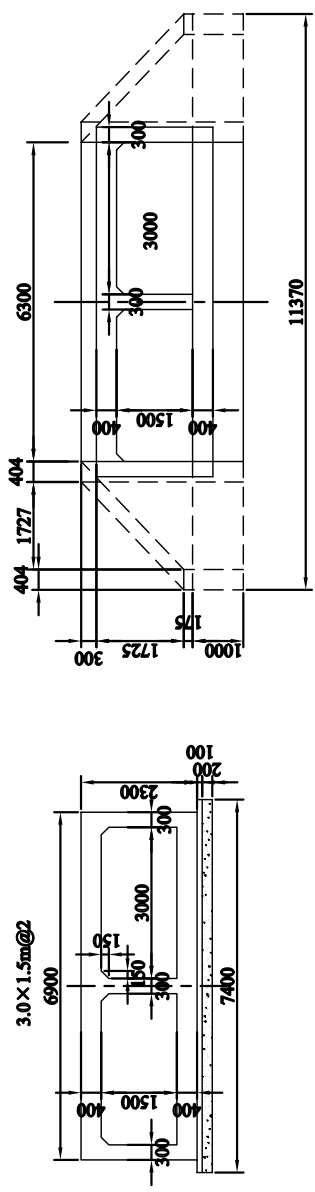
General View of Box Culvert(BC2 Sta.309+058)
